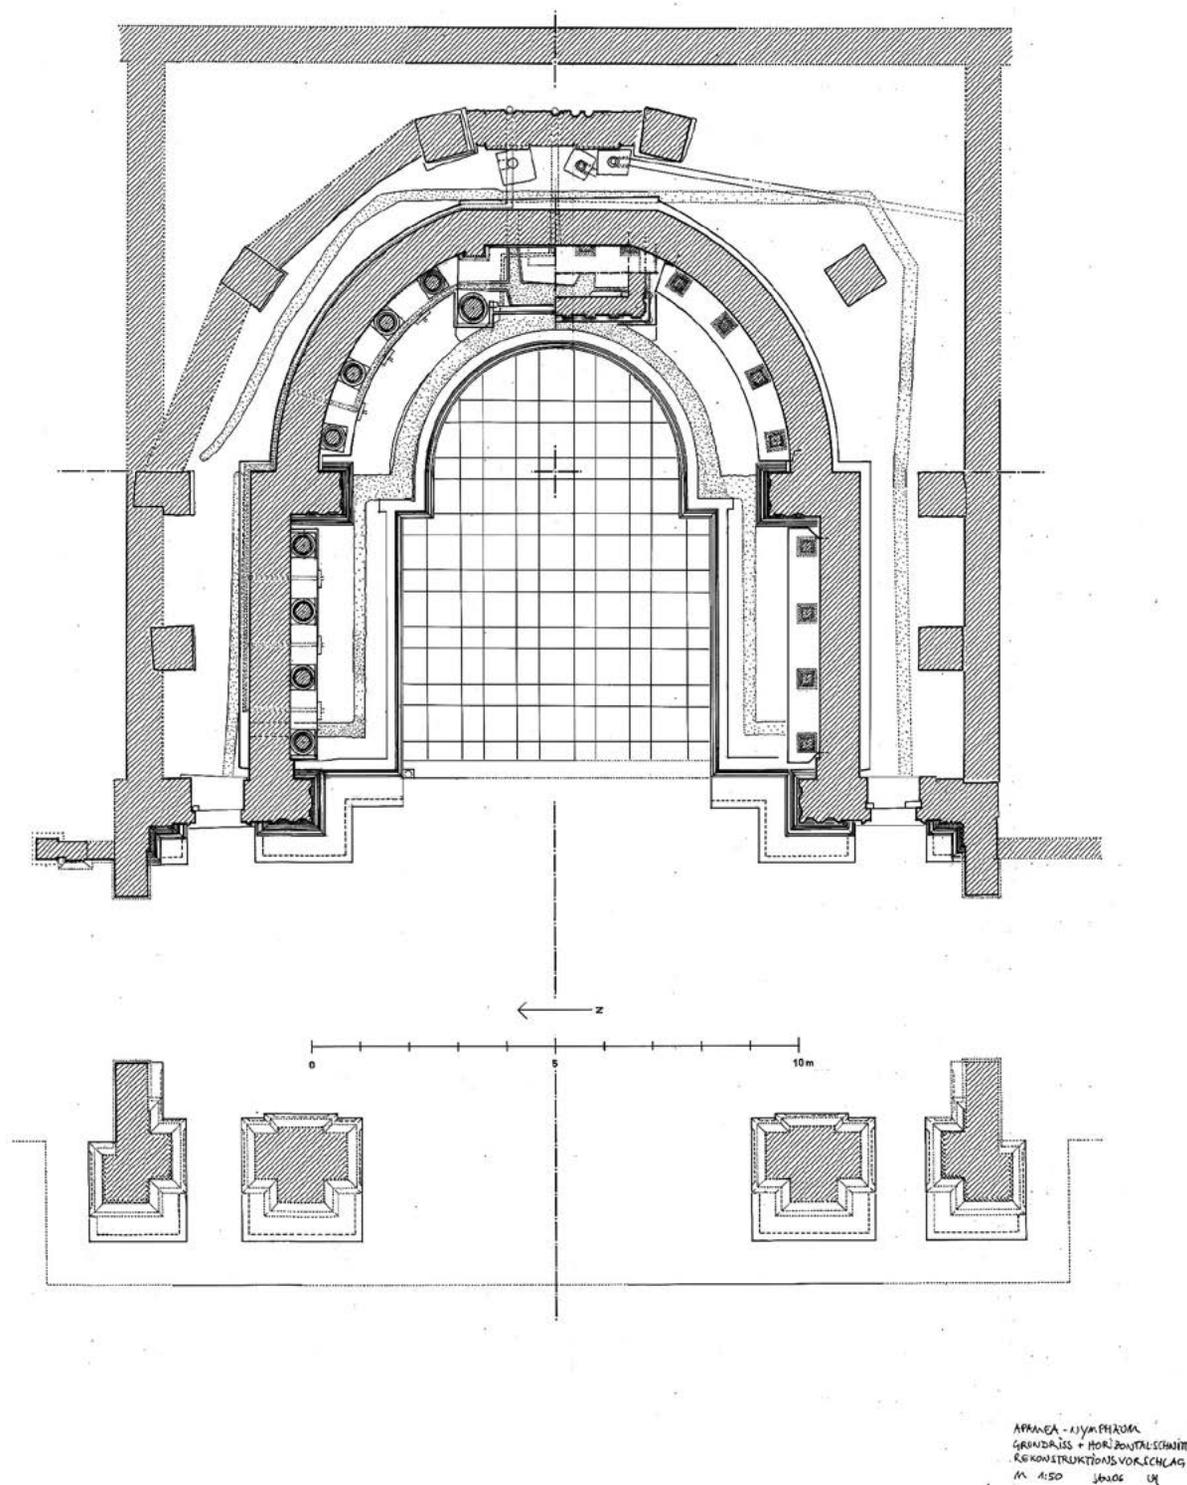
Apamea, Nymphaeum. Ground plan reconstruction (© CBRAP).
